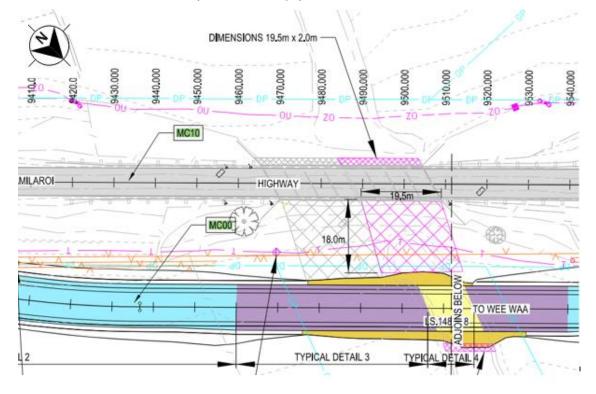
Side track plan showing property boundary (Source: TfNSW)
